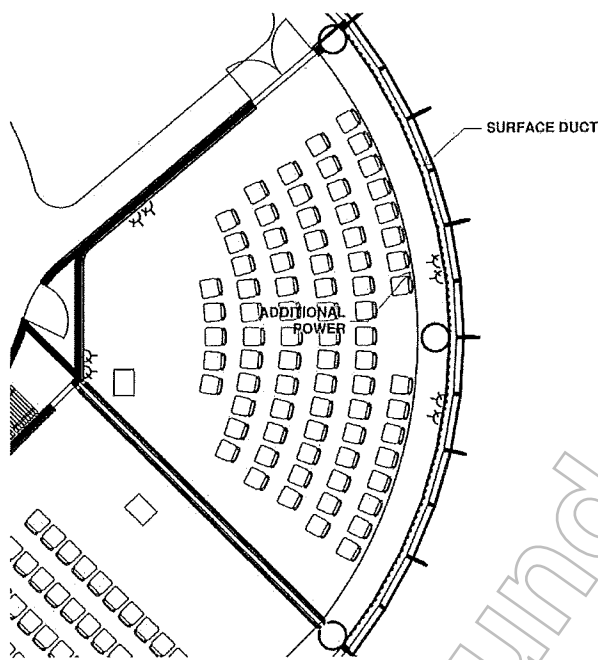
Multi-Function room 41.12 (1:200) – Part plan ID-2641[D]
